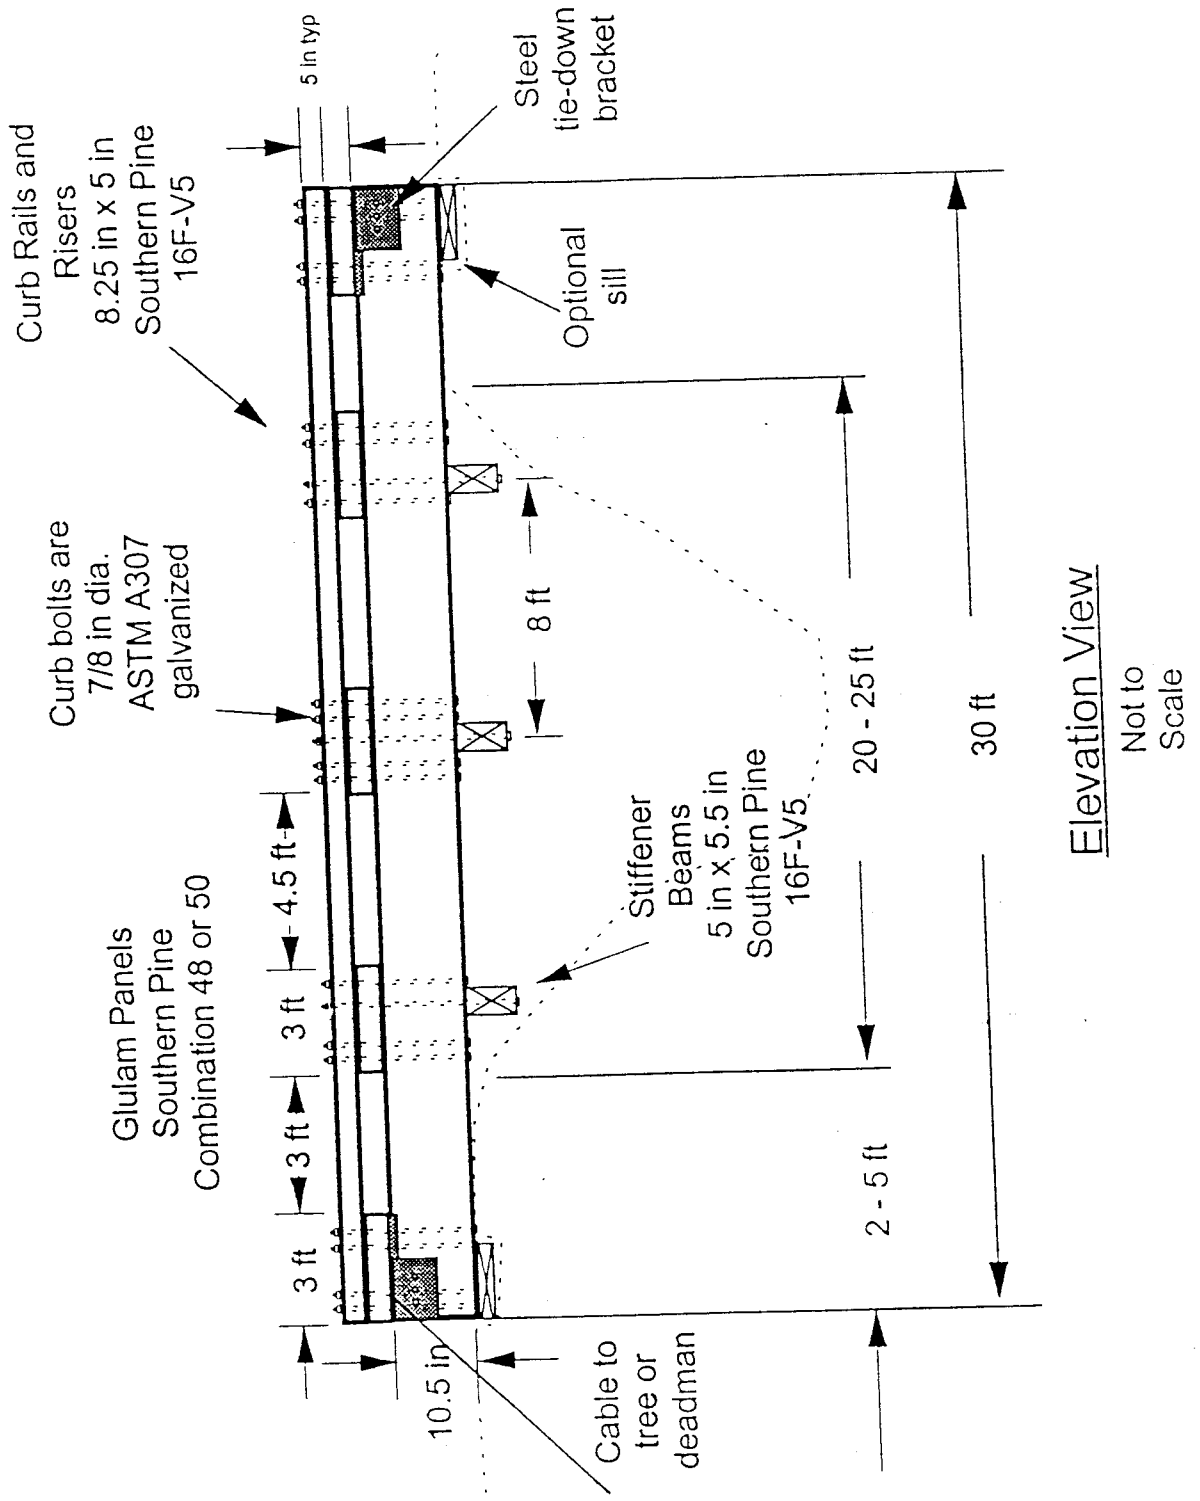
Elevation view of the longitudinal glued-laminated (glulam) bridge design.
